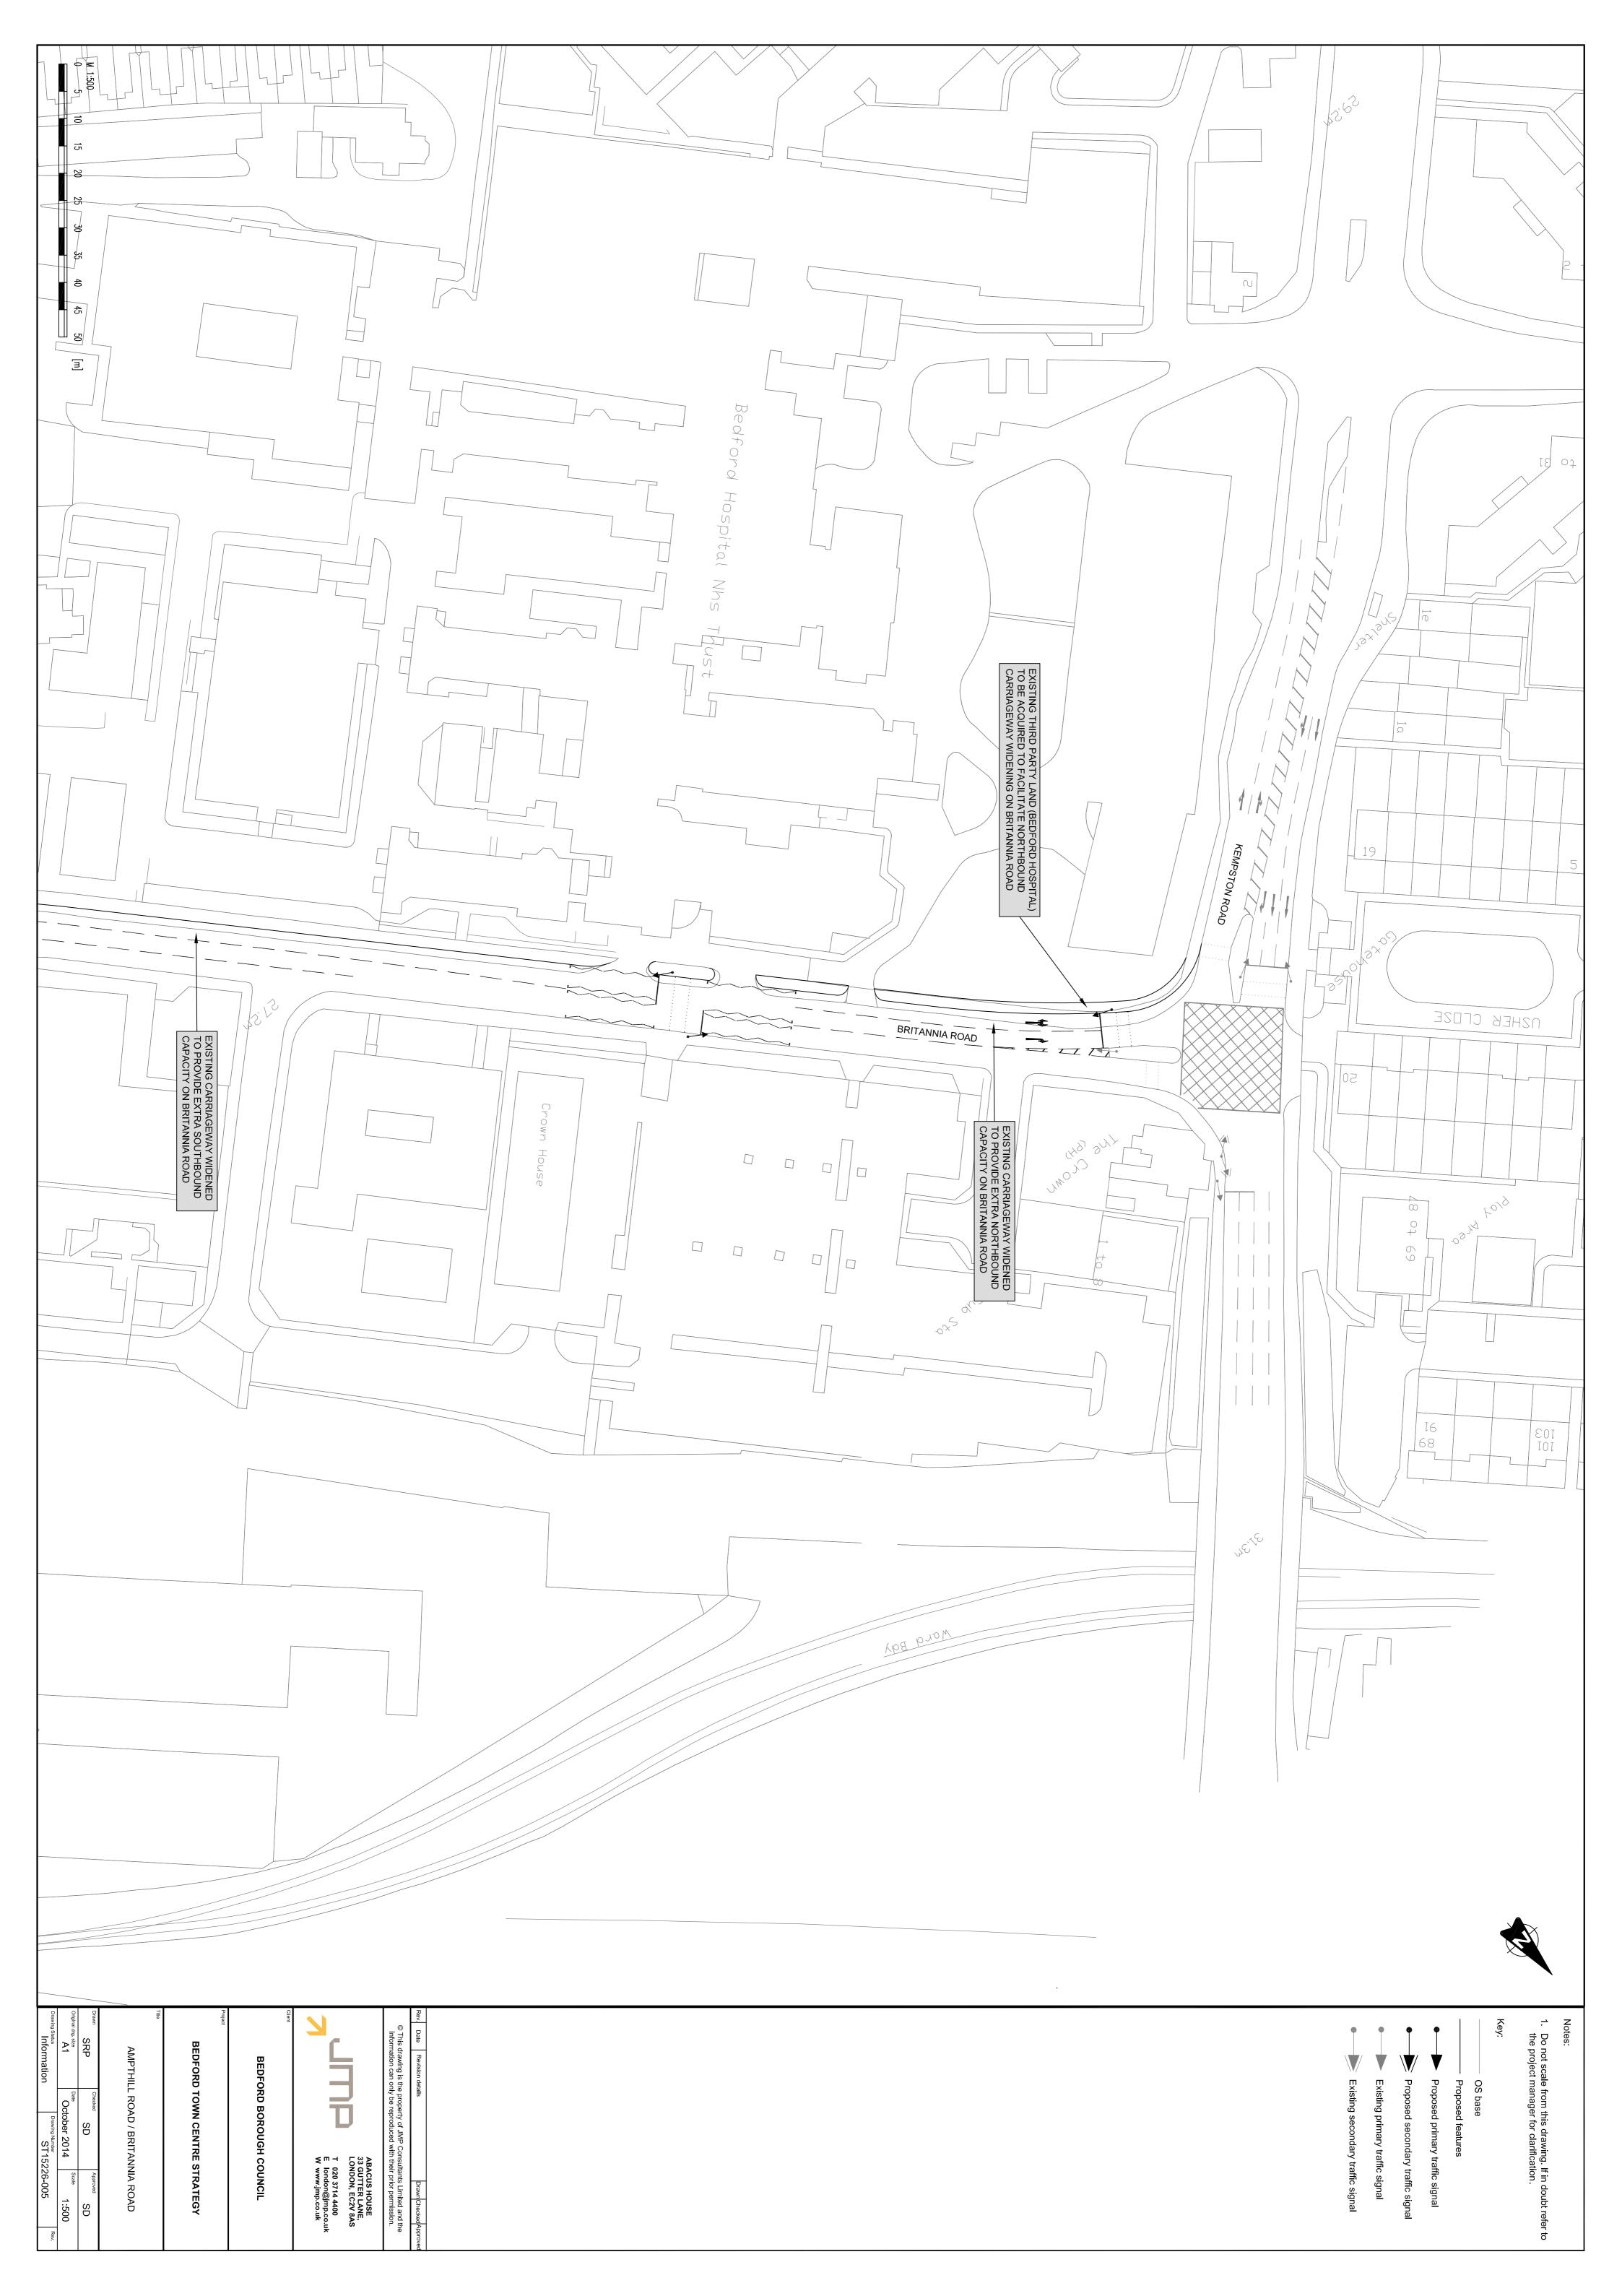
Area 3 – Britannia Road / Ampthill Road
